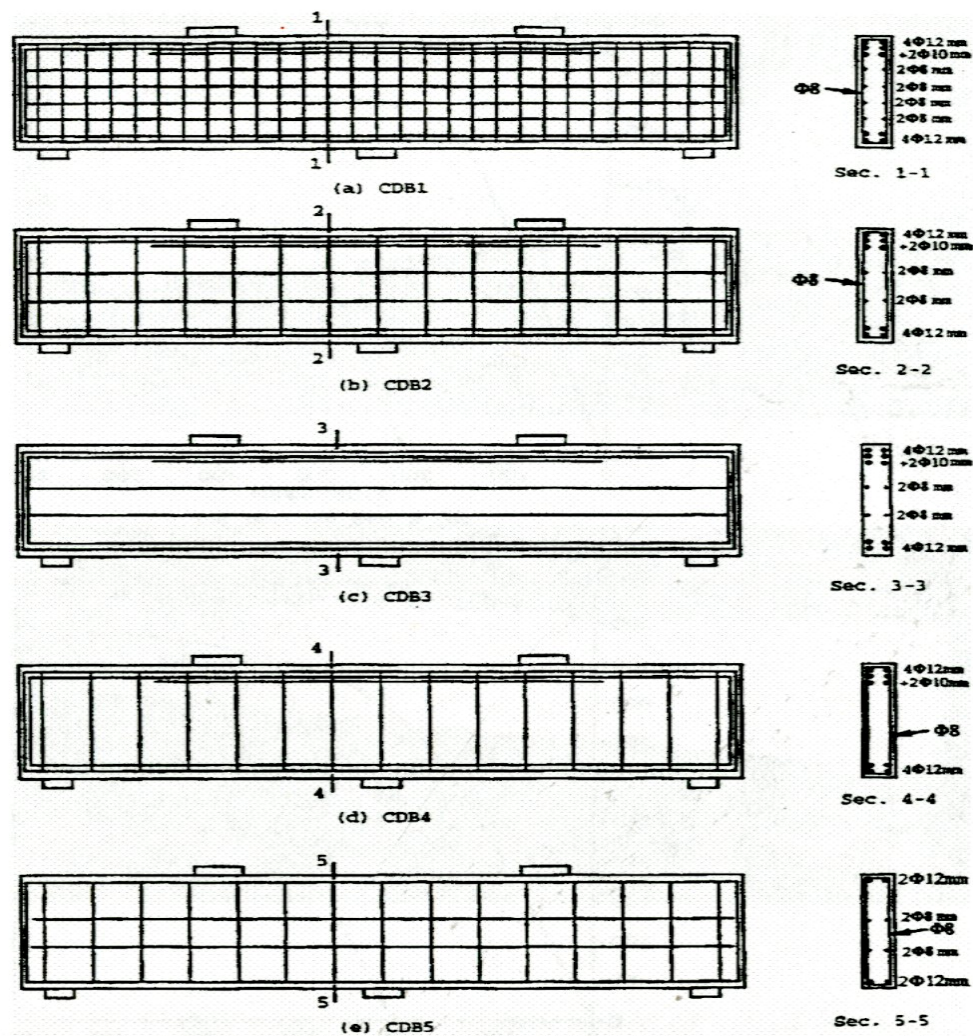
Details of specimen reinforcement (Ashour 1997)
